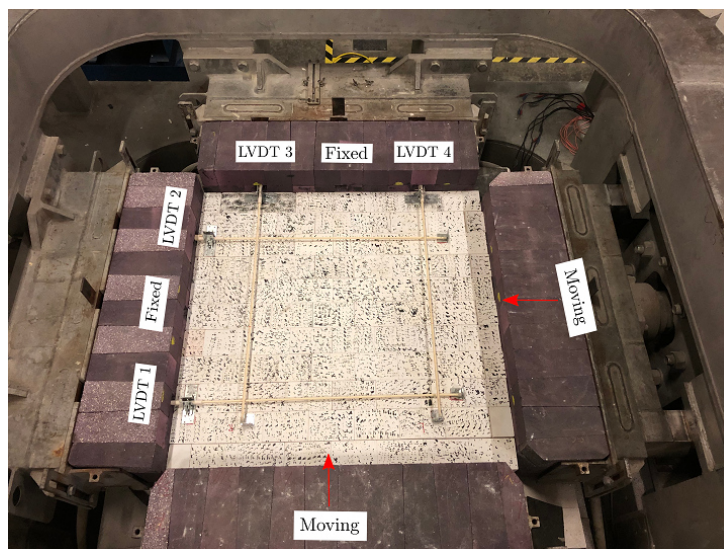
An example of refractory masonry wall subjected to biaxial compression at room temperature (S05) showing the arrangements of the LVDTs, wall with speckle pattern, moving and fixed plungers.
